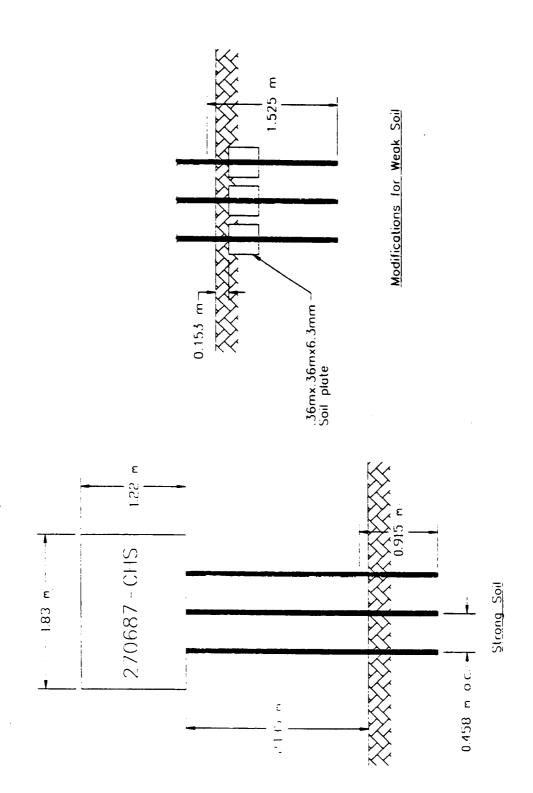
Details of the Chicago Heights Steel break-away sign support installation.
